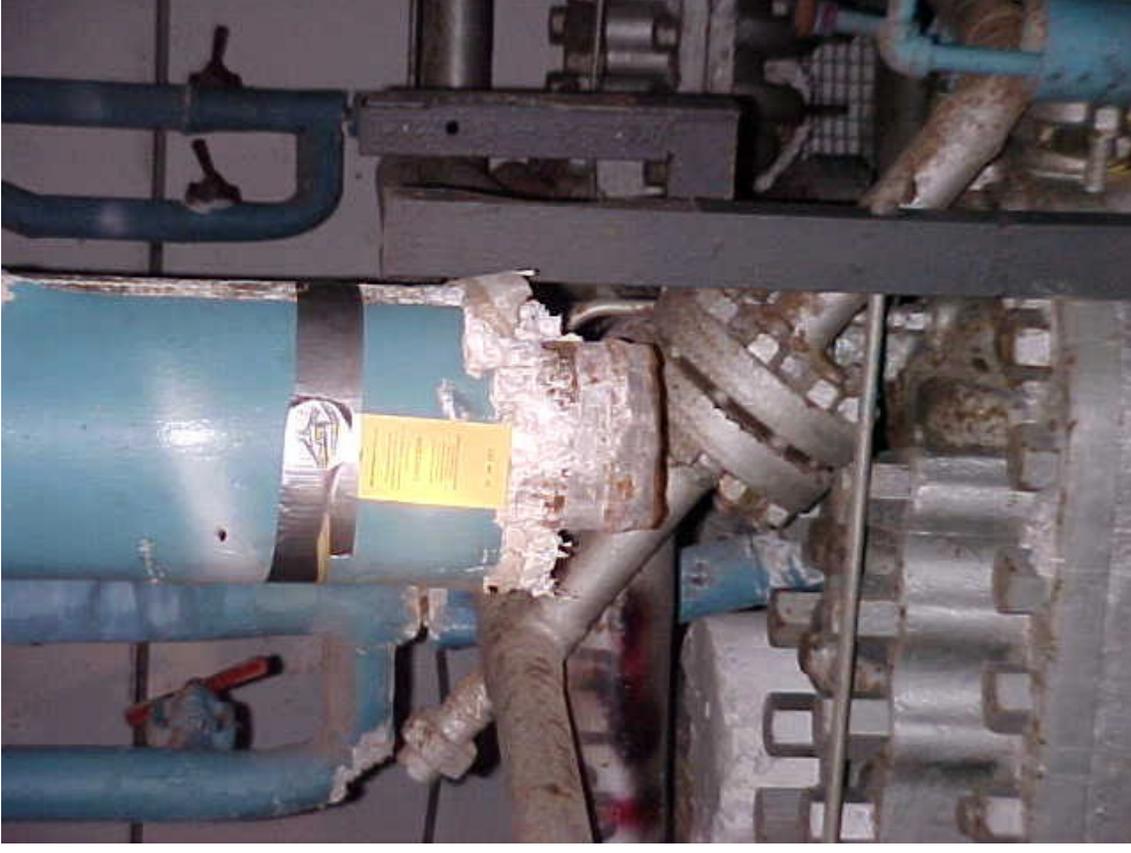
Asbestos Assessment Location 4. This photo was taken looking to the northwest. The assessment was performed on the TSI pipe insulation located in the southwest section of Building 38 in the compressor area.
